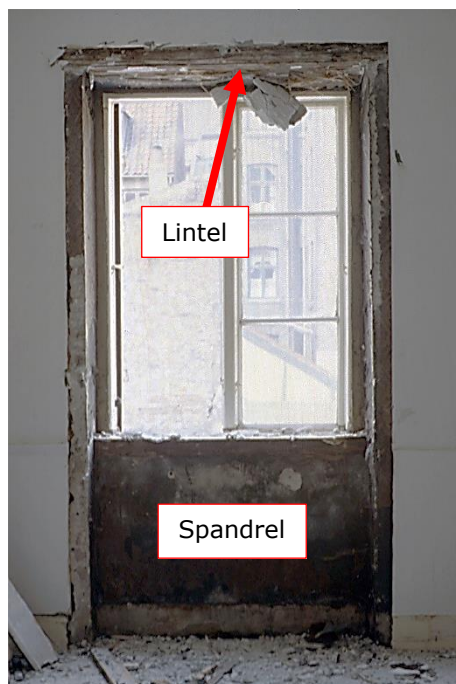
Interior facade wall, window section. After dismantling finishing into masonry surface. A lintel over a window can be seen in Figure 35.
